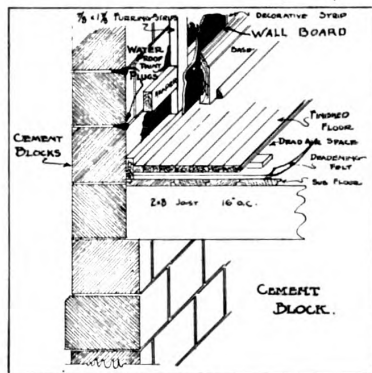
Wallboard used in the cement block house. The inside walls should be given a coat of waterproofing before applying the wallboard.
